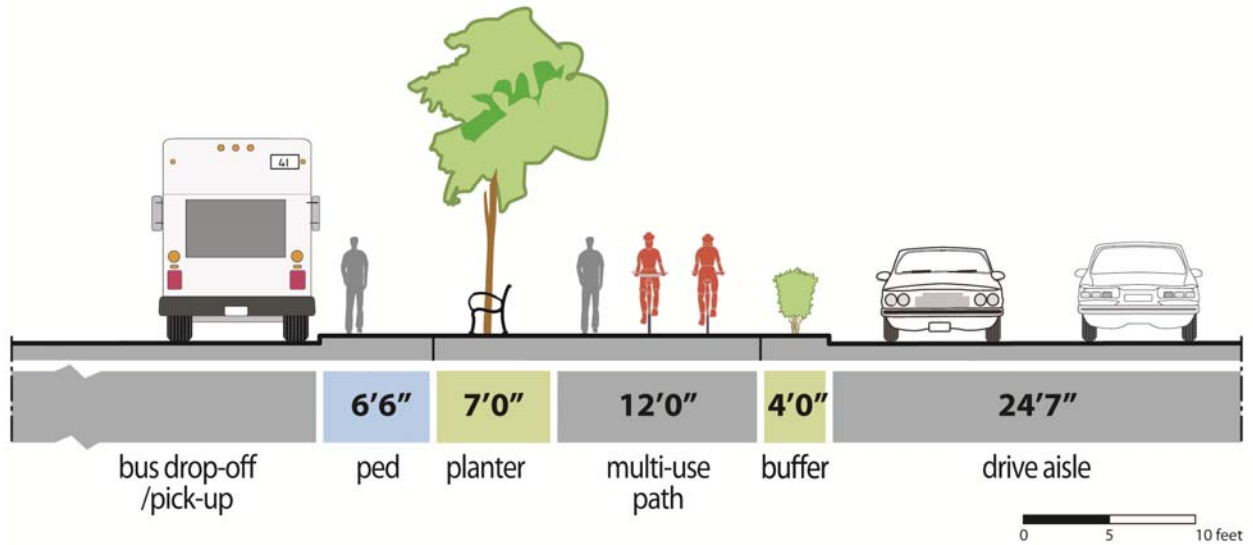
Segment 1C Humboldt Avenue - Anchor Street to Bay Street Proposed Improvements
